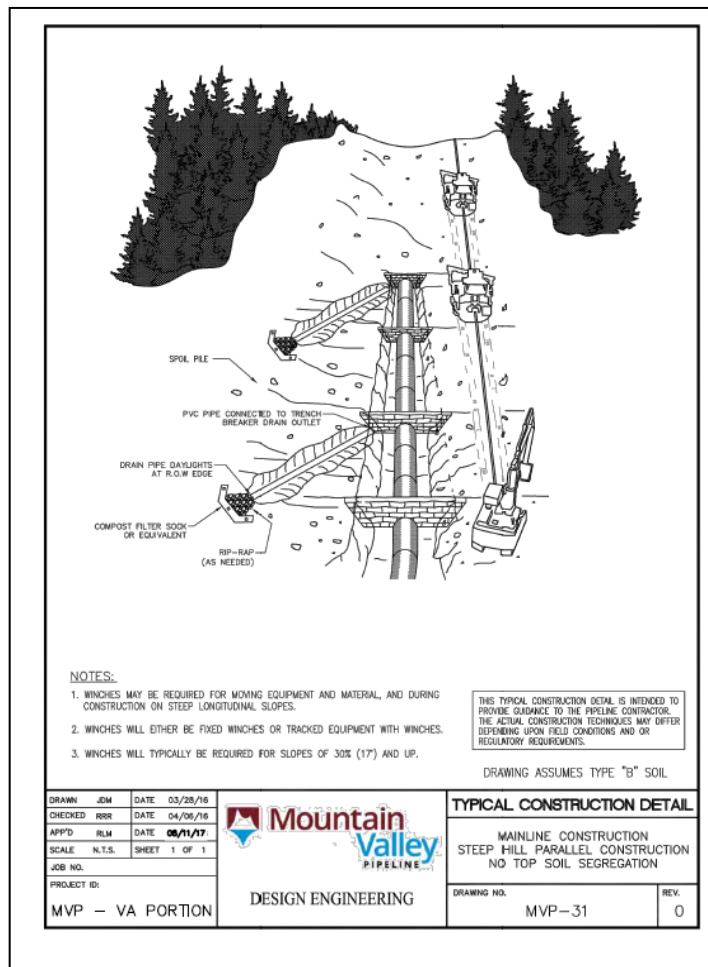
Excerpt from POD Appendix C-3 E&S Plan Sheets of Environmental Detail MVP-31, illustrating the groundwater drainage from the pipeline trench, with groundwater directed to the land surface beyond the ROW.
